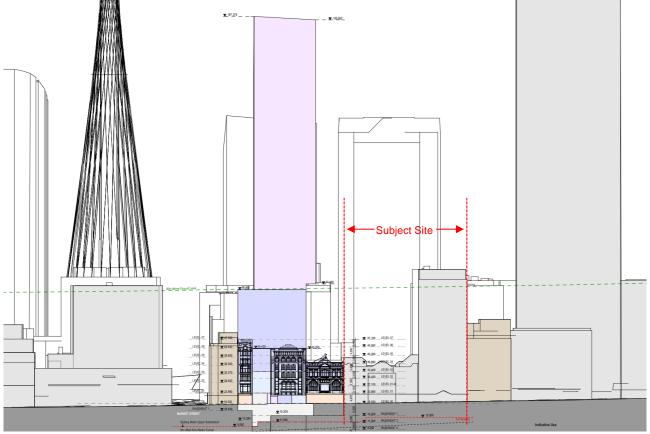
Extract of approved building envelope under D/2018/1246 – Pitt Street elevation (showing the subject site indicated in red)
